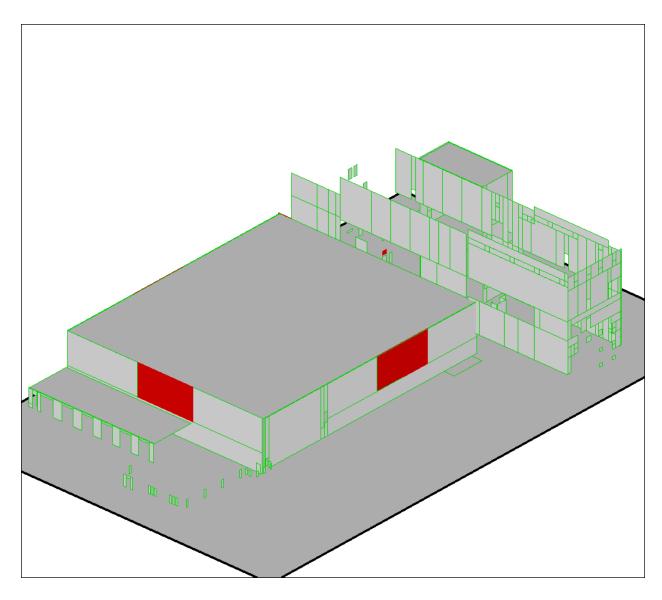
Vented Multipurpose Building Failure Patterns (in Red)
